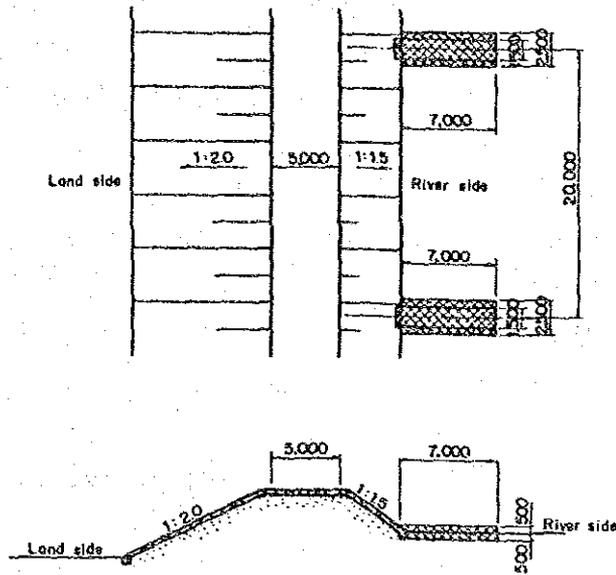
Typical Section of Groyne (Scale 1:200)
